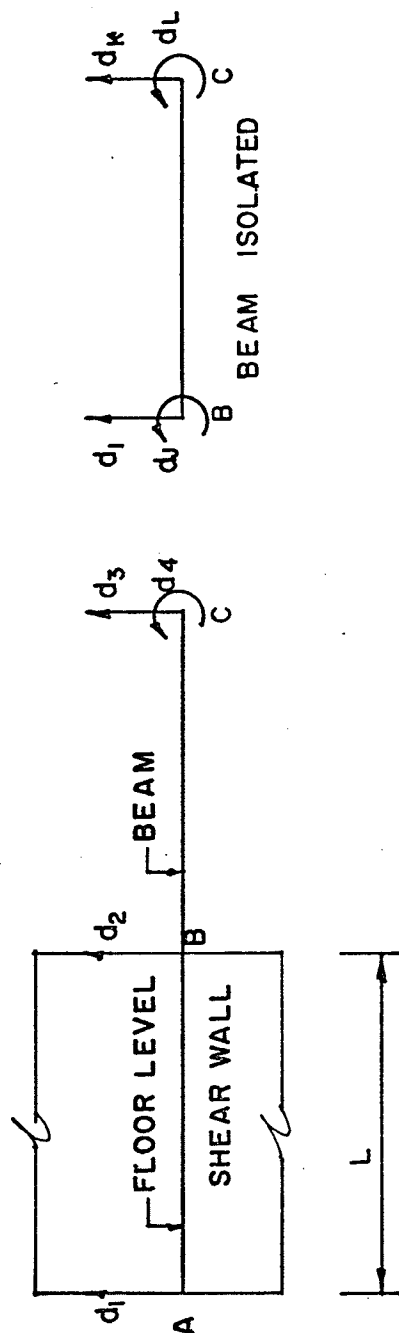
LEFT END OF BEAM FRAMING INTO SHEAR WALL
